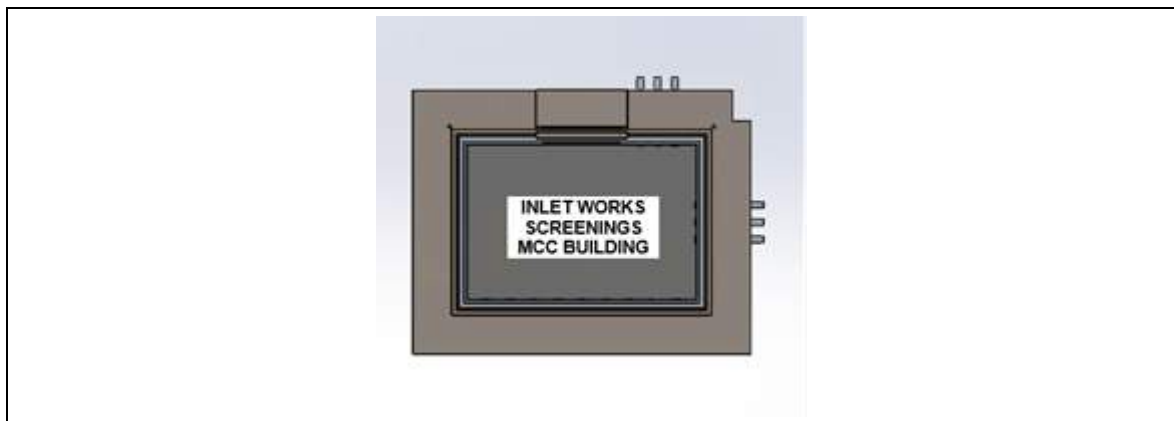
Typical Layout of the Inlet Works Screenings MCC Building at Ultimate Capacity
